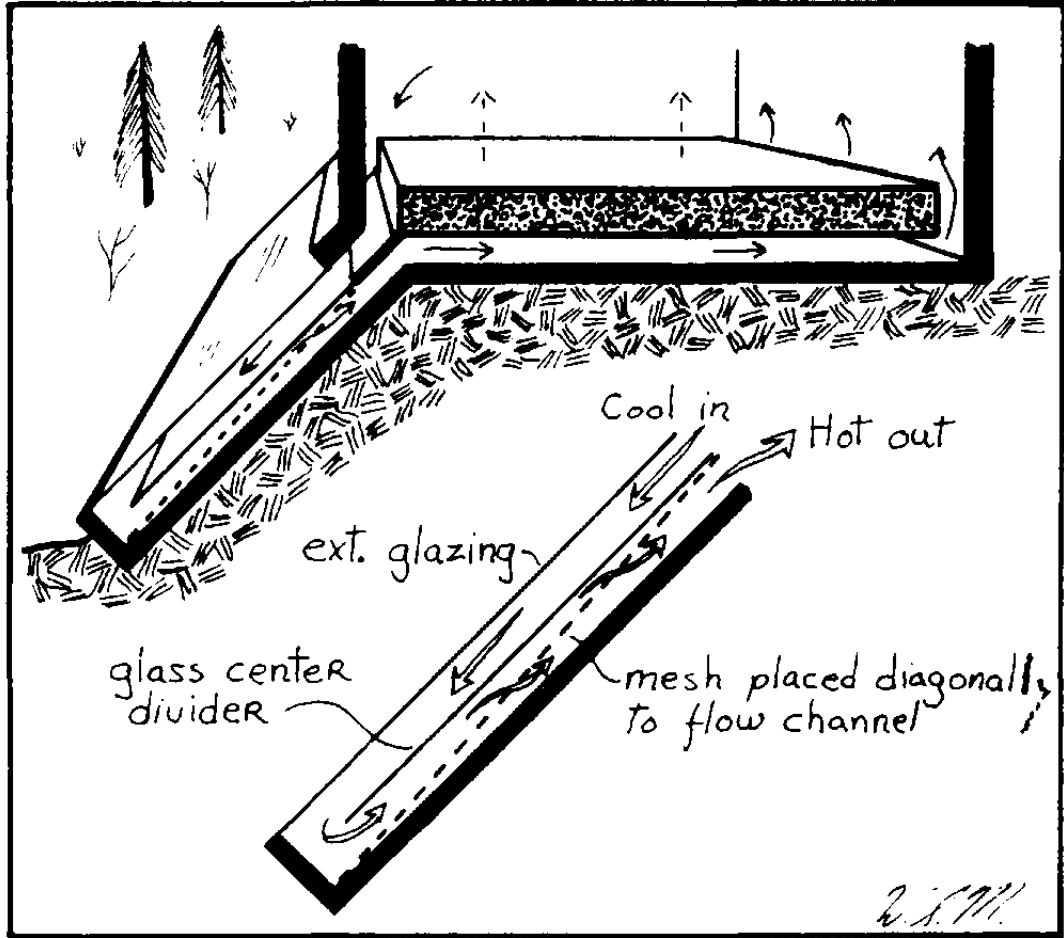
Center-glazed collector with masonry floor heat storage (MOR-1).
